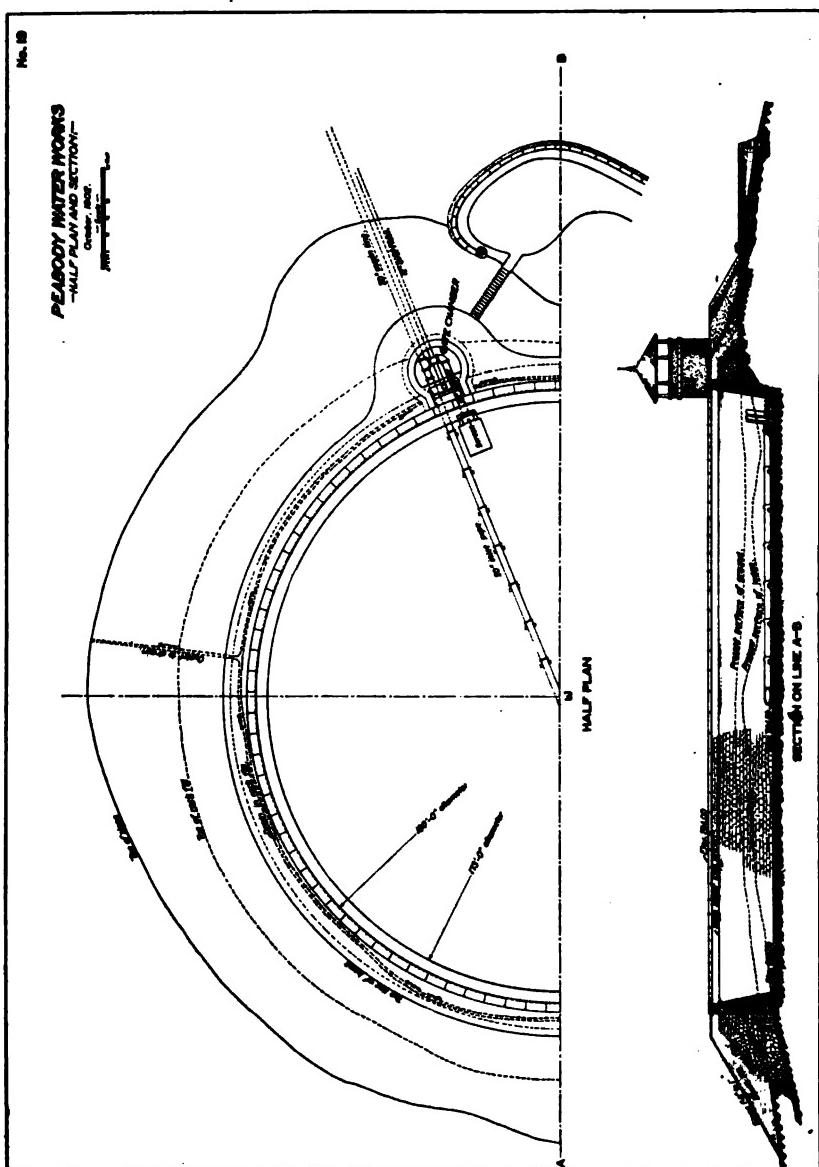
HALF PLAN AND SECTION OF RESERVOIR.
